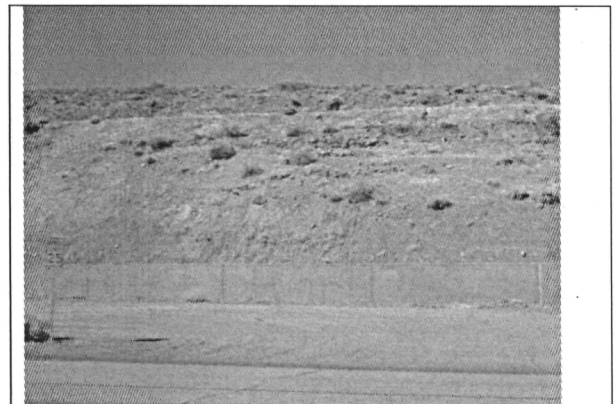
Minor erosion of slope behind retention wall, southern end of MS004.
